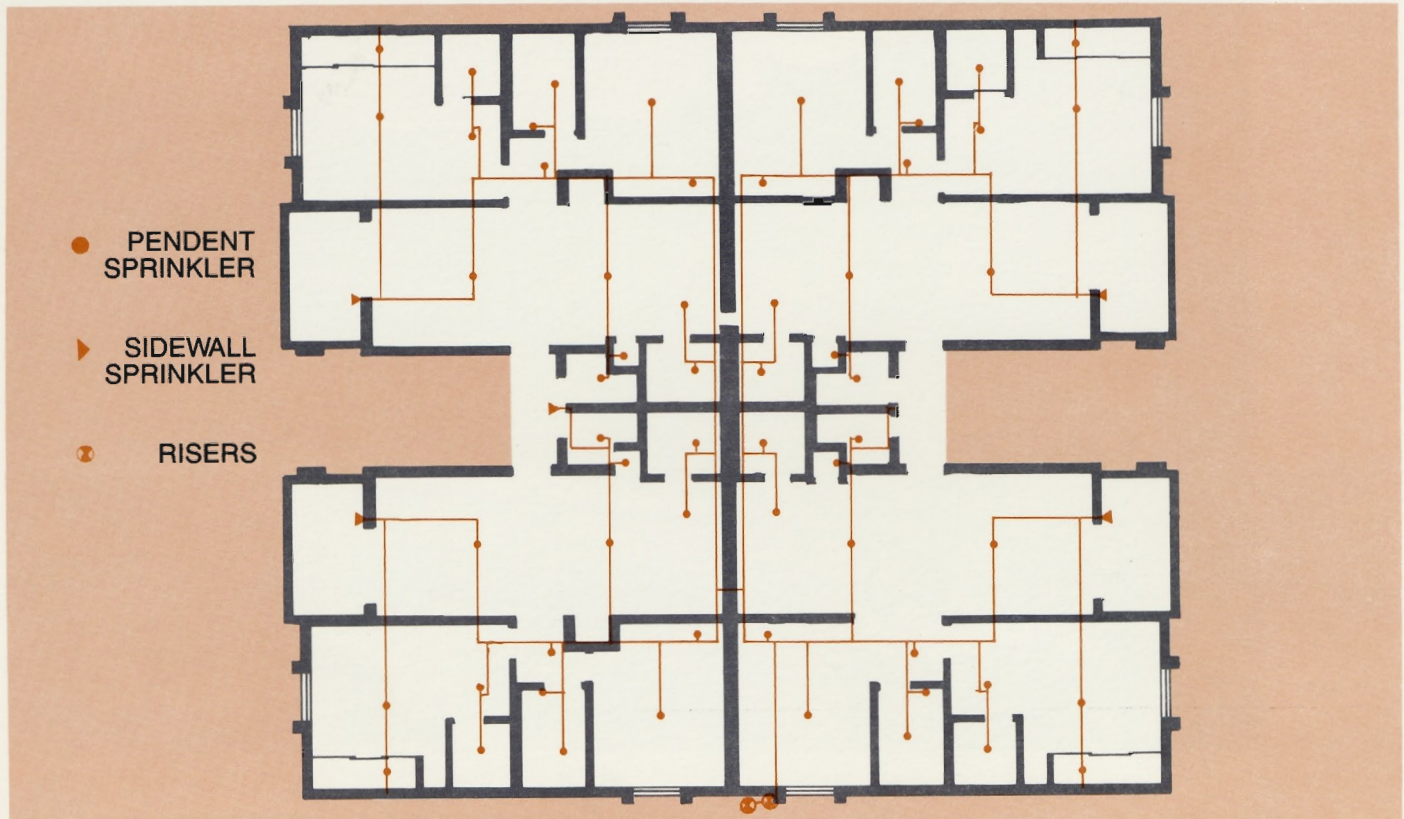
Sprinkler plan for typical floor in Pelican Bay Apartments.
